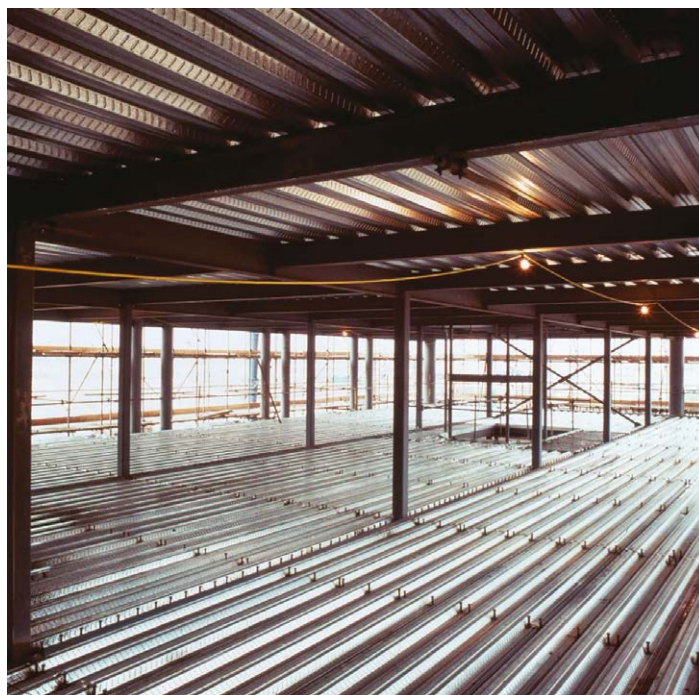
A continuous floor plate awaiting concrete pouring. Rows of studs indicate the beam lines, and even with continuous concrete the slabs will be designed to be simply supported at these points (at ambient temperature)
